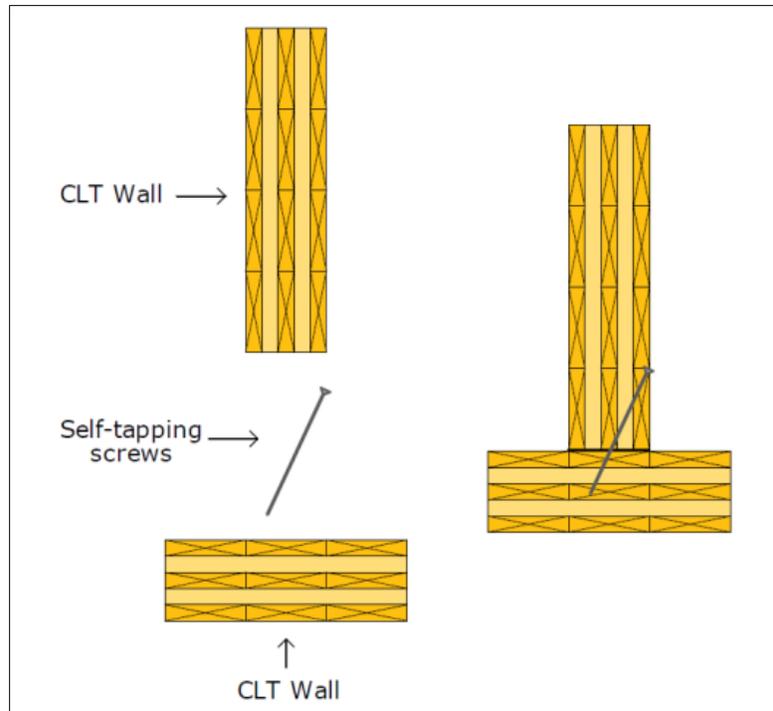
Wall-to-floor connection. Cross sectional view [4]
